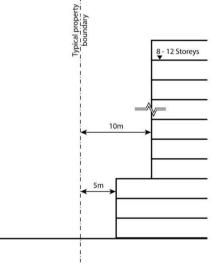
Frontage to Springvale Road, High Street Road and Snedden Drive
